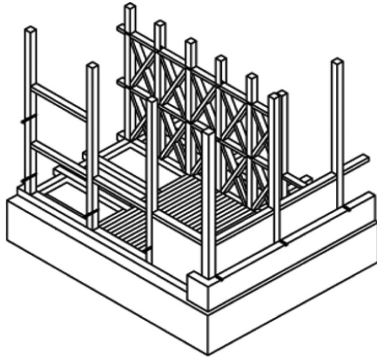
Casa baraccata* building system. Credits: D. Omar Sidik.
